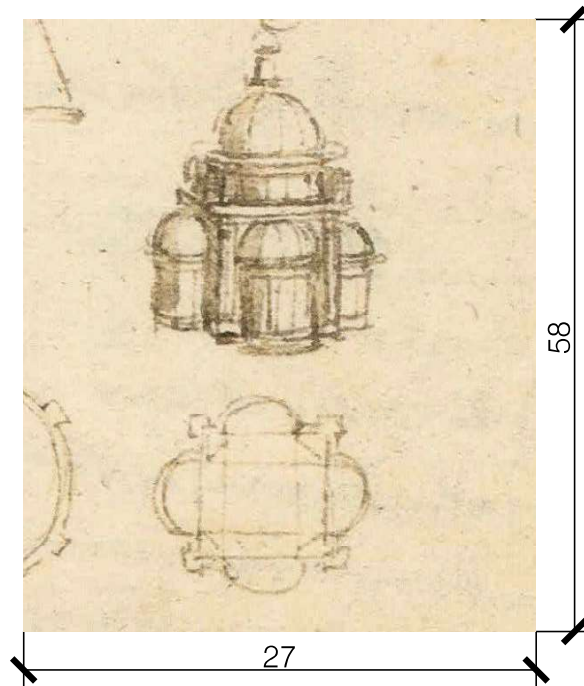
Ms. B, f. 93v: drawing of the church “D” with its dimensions in mm.
